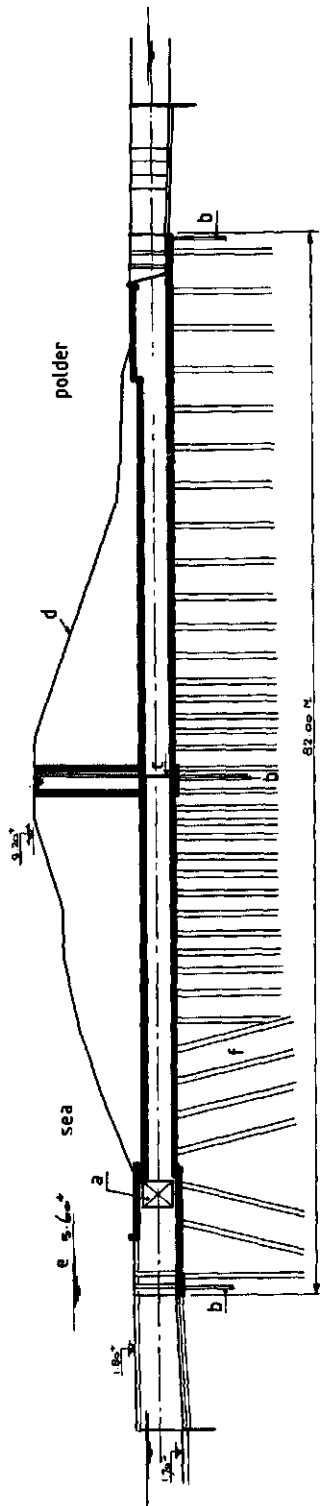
CONCRETE CULVERT SLUICE. (longitudinal section)
